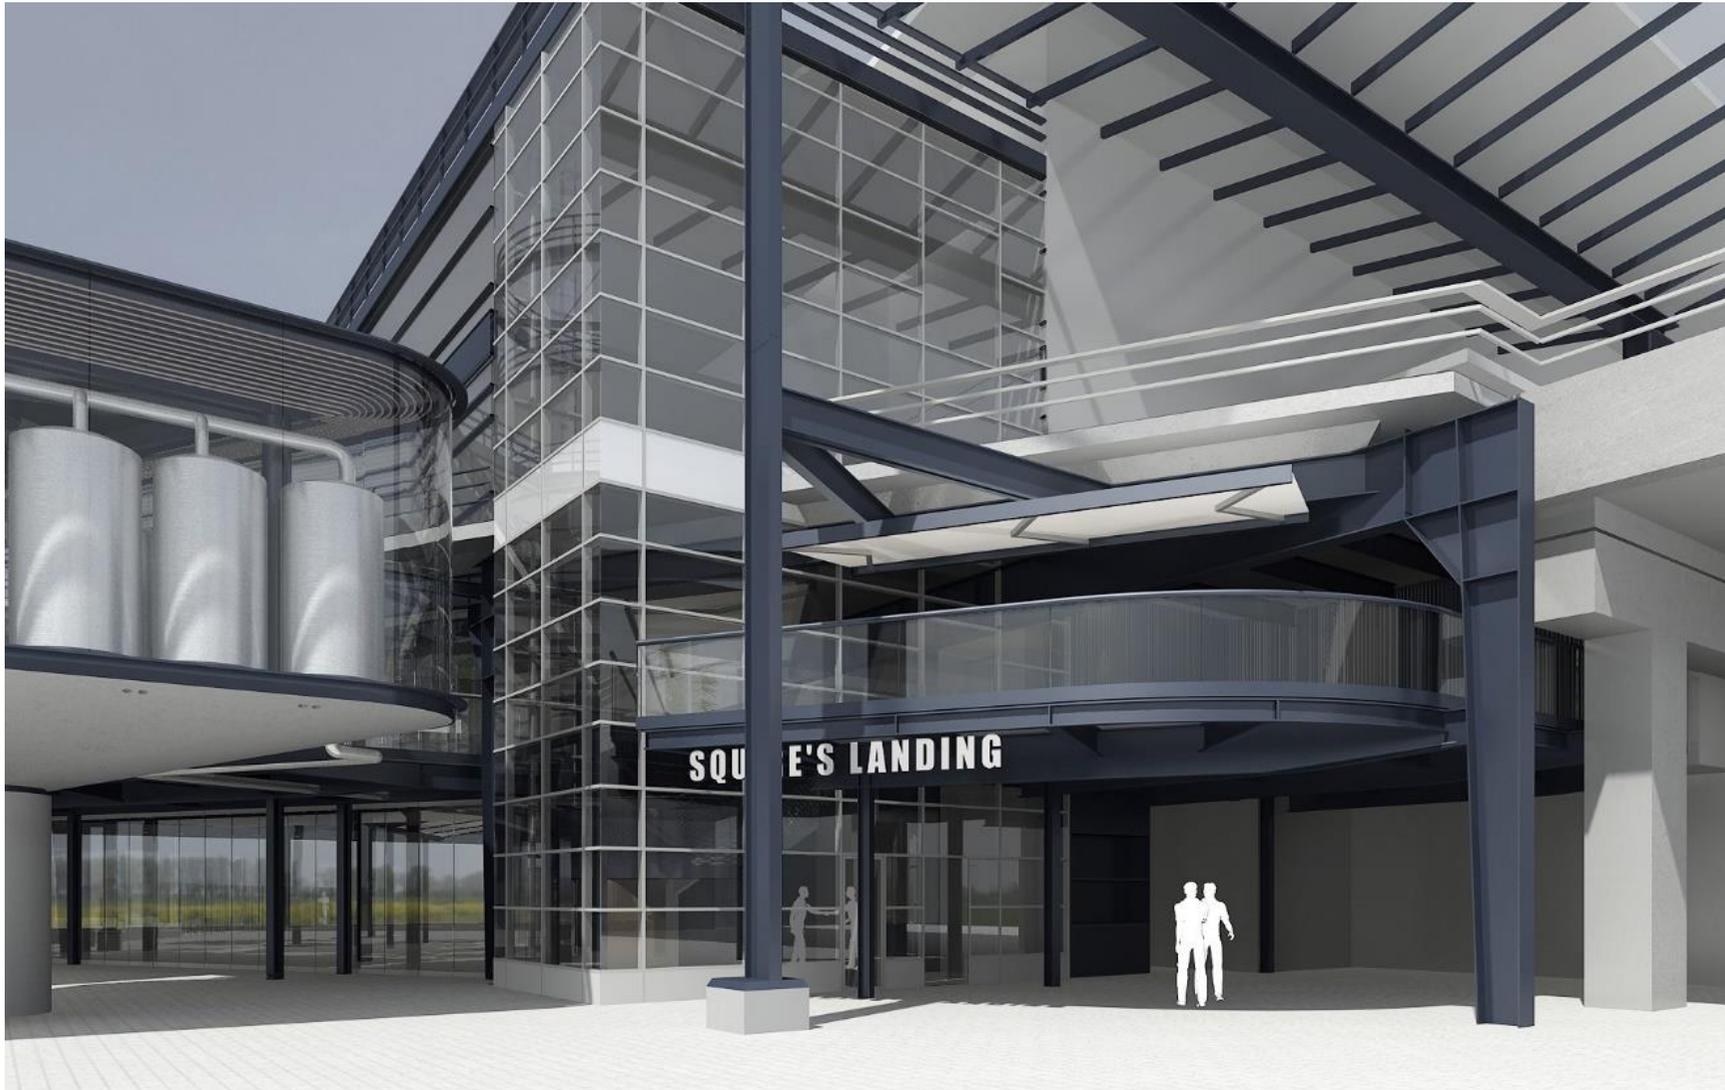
Proposed awning on western façade (Source: Collins and Turner)
